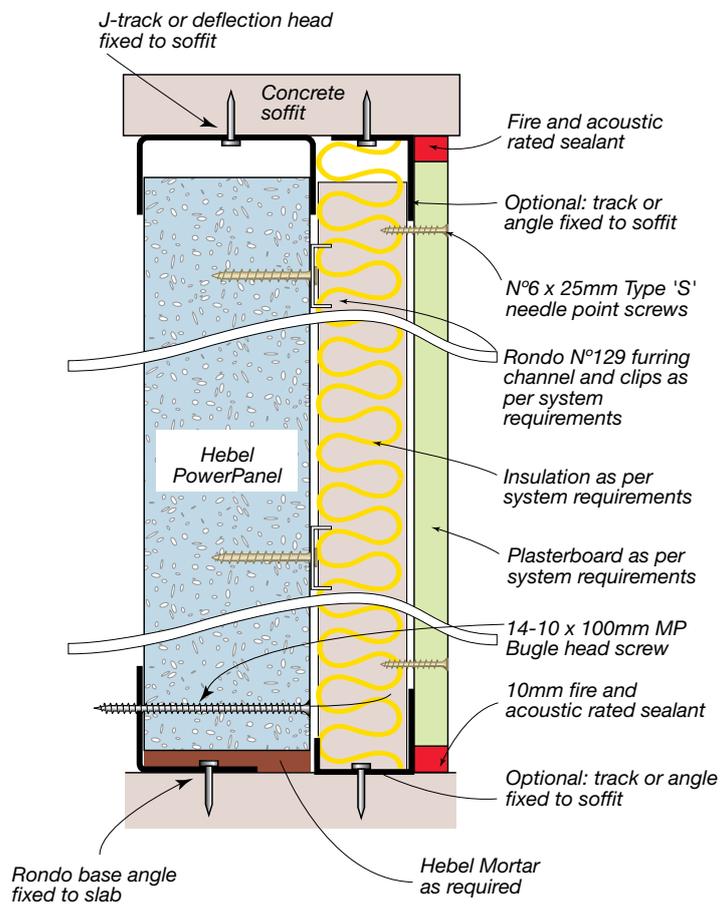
Service Shaft Wall Option 2 - Vertical cross section detail
